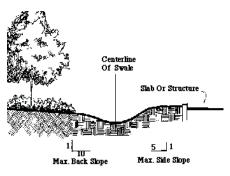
A typical cross-section of a grass drainage swale.
